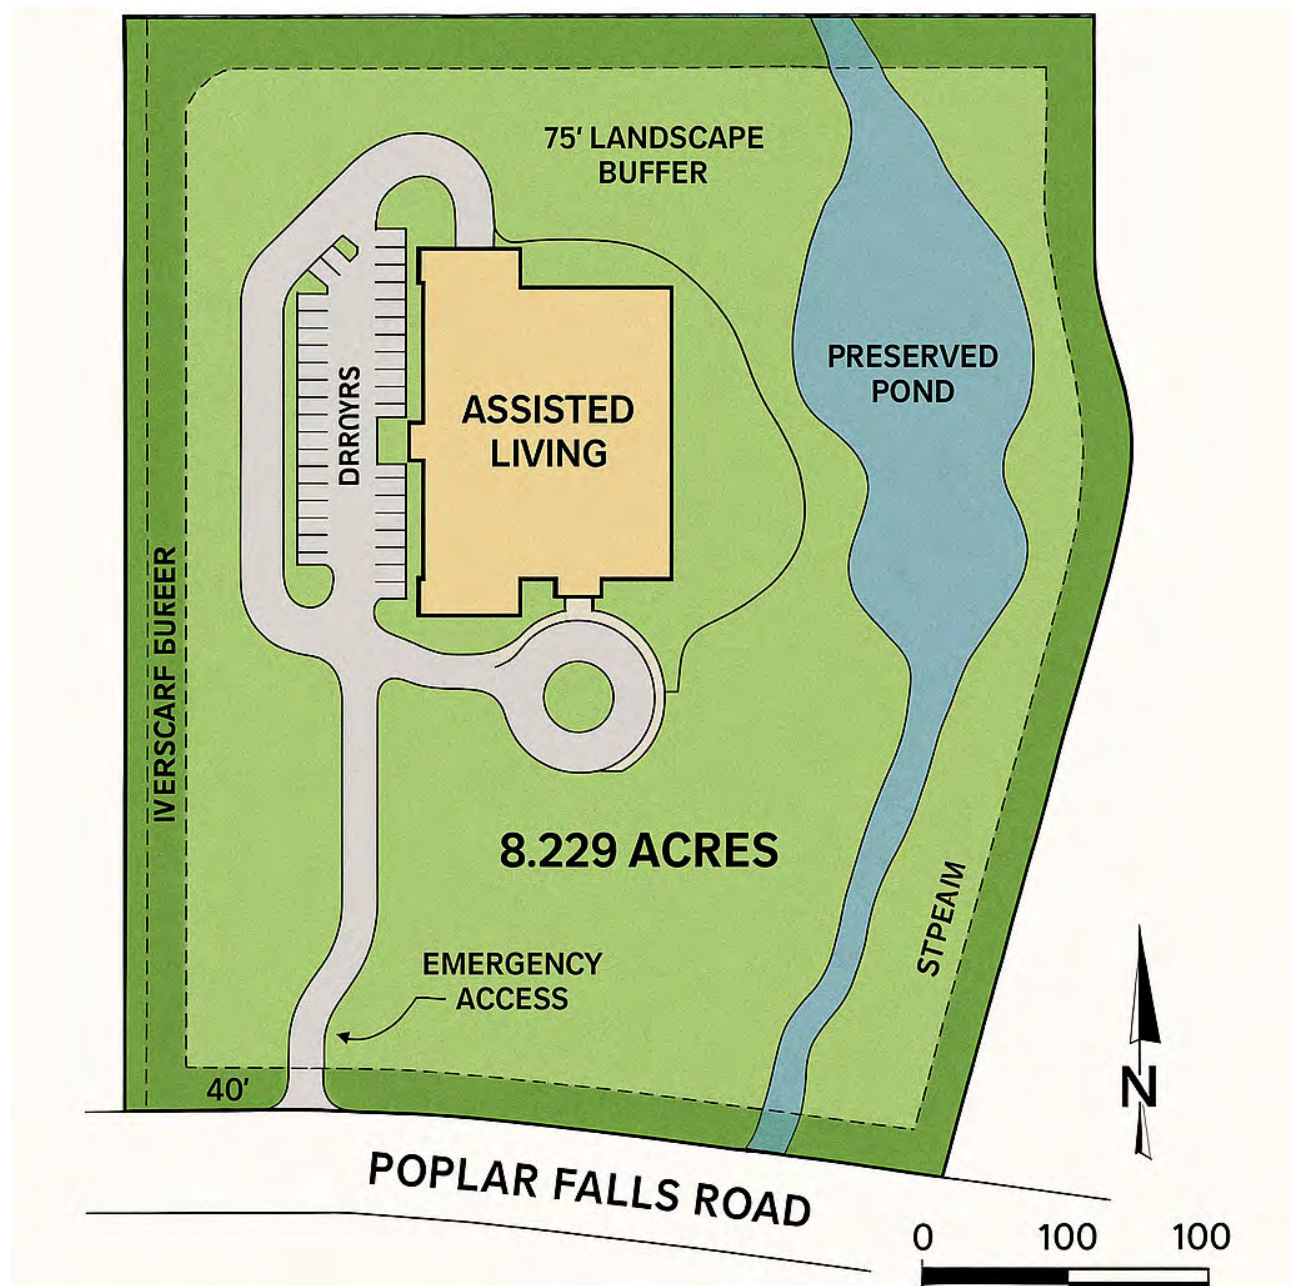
Concept Site Plan – Assisted Living Rezoning Plan, 2111 Poplar Falls Road, DeKalb County, GA.
